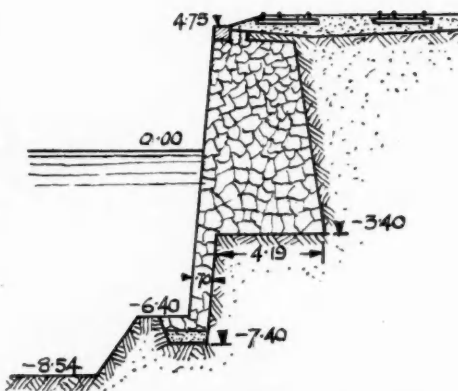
Cross section of the original dock wall at the Central Dock, La Plata.
